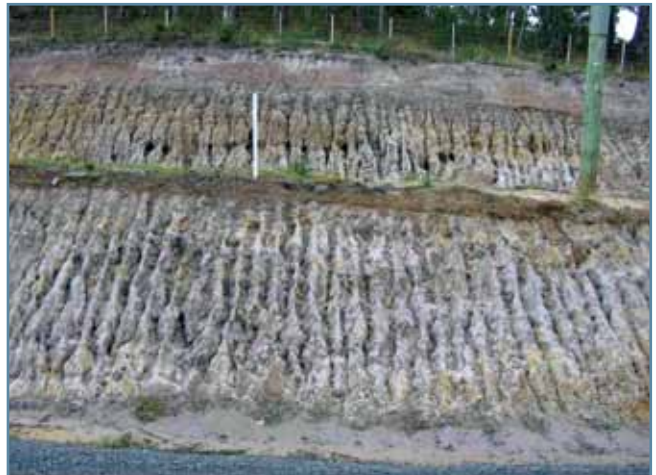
Rill and tunnel erosion caused by excavation of sodic soils for road construction. Dunalley.
